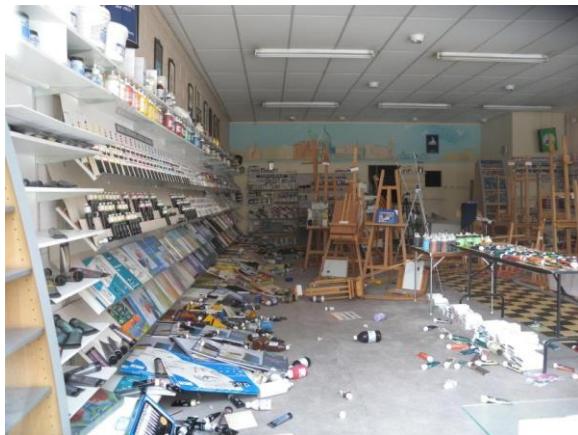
Significant nonstructural damage inside a building that is structurally stable after an earthquake event. (Photo Courtesy of Degenkolb Engineers)
